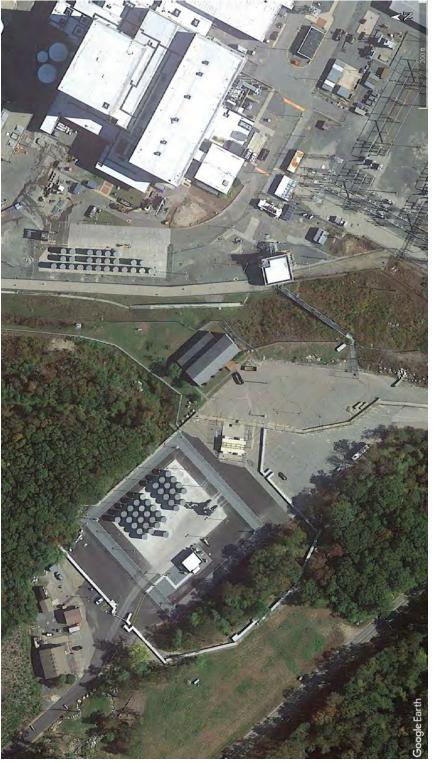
Construction of New Pilgrim Independent Spent Fuel Storage Installation (2019)
